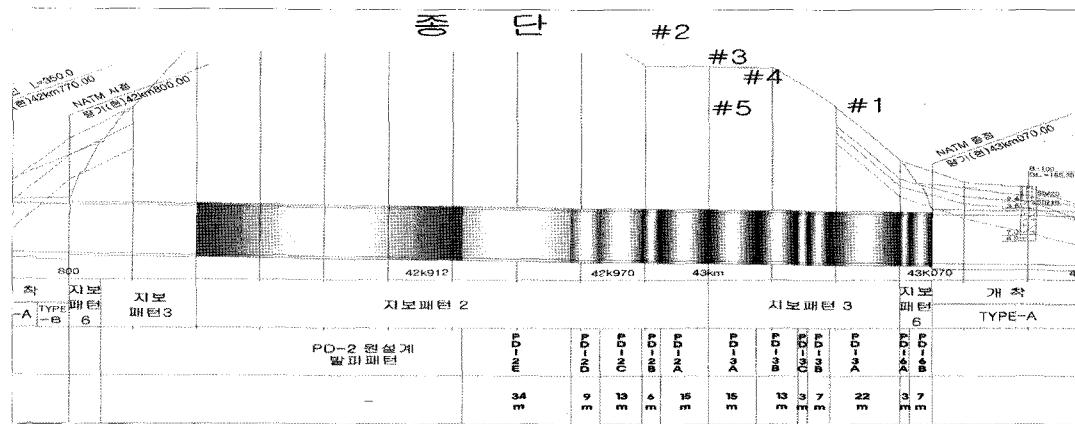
The blasting pattern by a blasting section at the upper half section of a tunnel (a cross-section).
